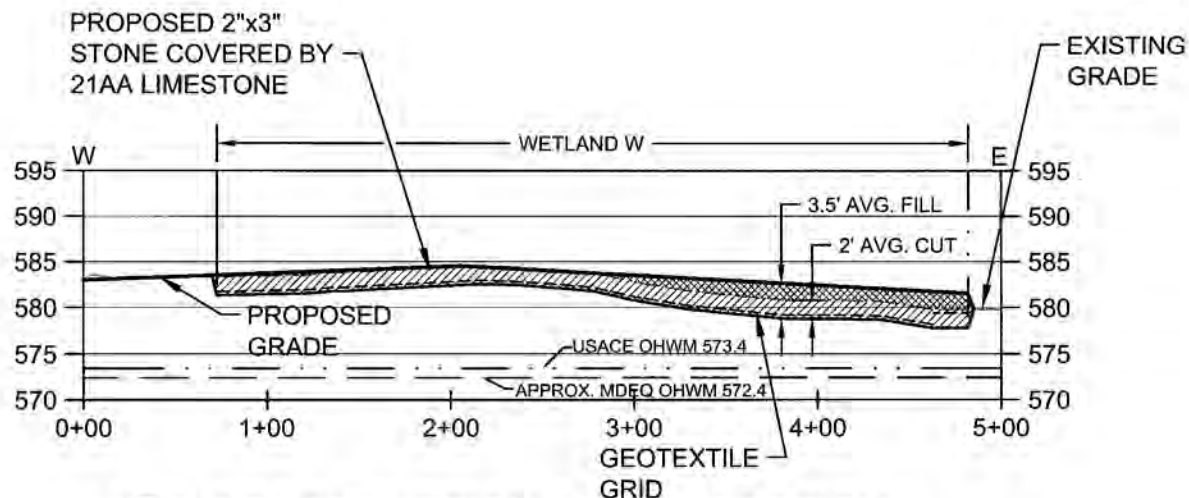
C CONSTRUCTION AREA 3 SECTION DETAILS
